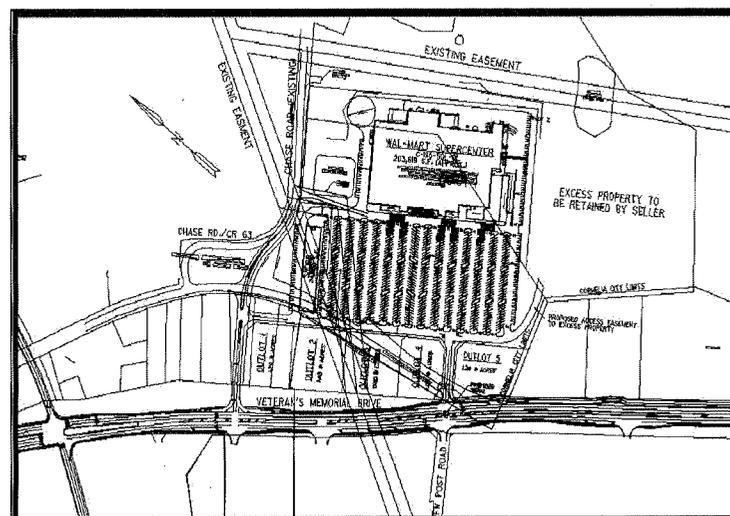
Proposed Commercial Development - Wal-Mart Layout
